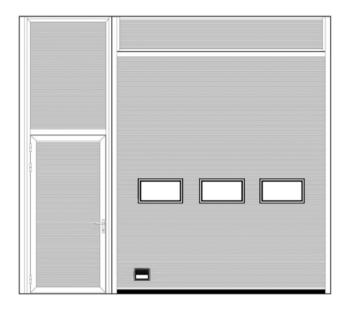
Industrial gate section, with a previous ASSA ABLOY designed Passdoor placed in a fixed section at the left side of the gate.
